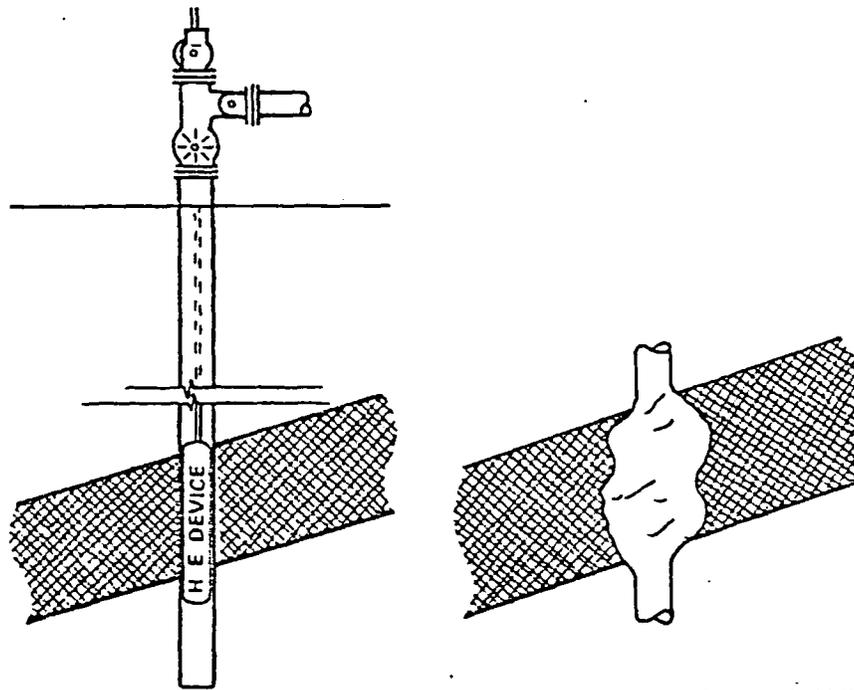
Borehole enlarged locally by springing it with chemical explosives (Ref. 3).
